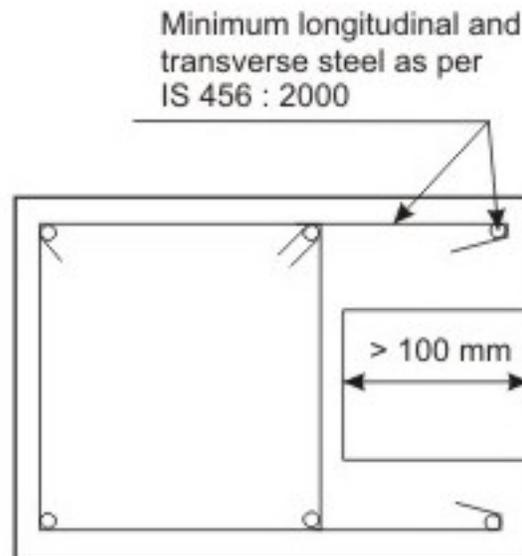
Reinforcement for column with projection > 100 mm beyond core
